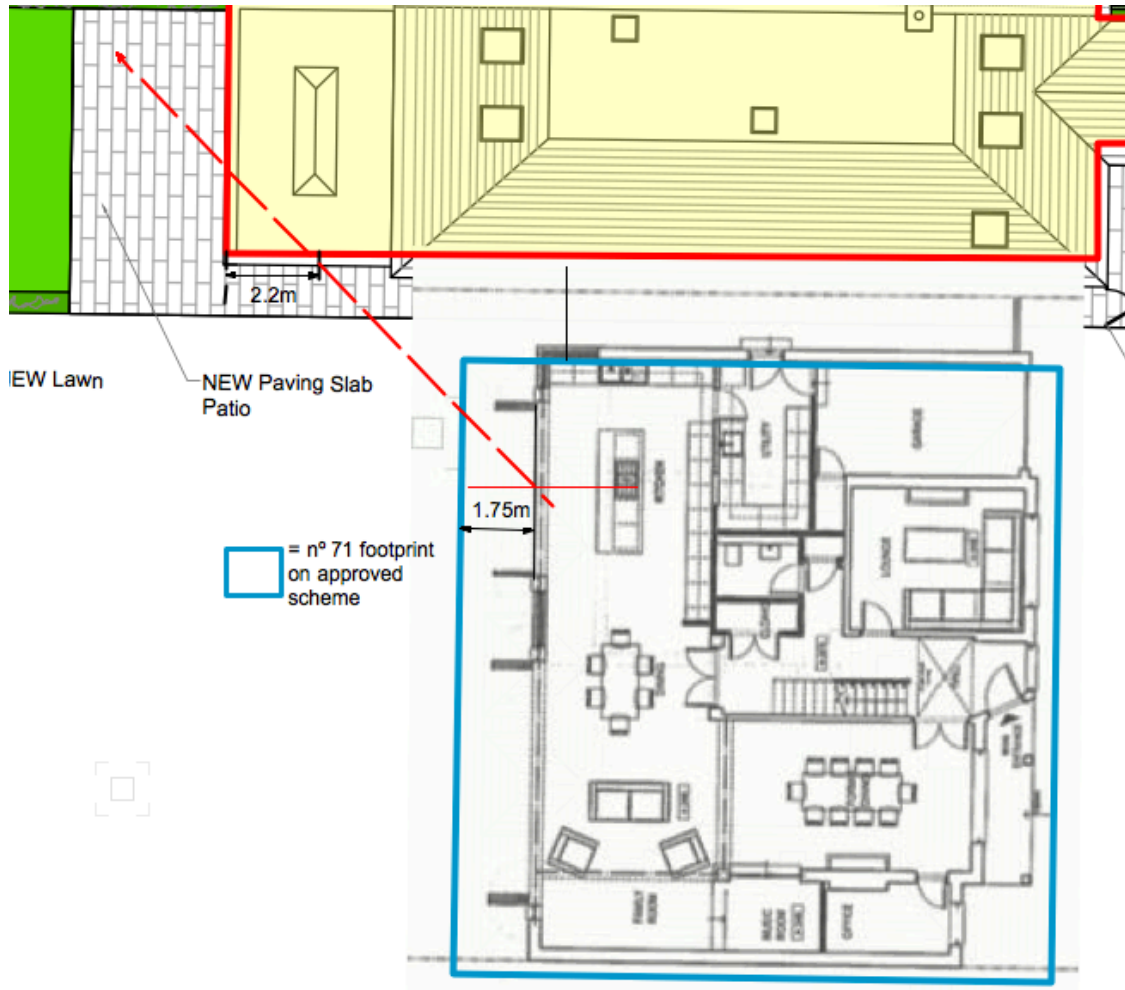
Marked up extract planning application plan 73PG-11 rev “B”
